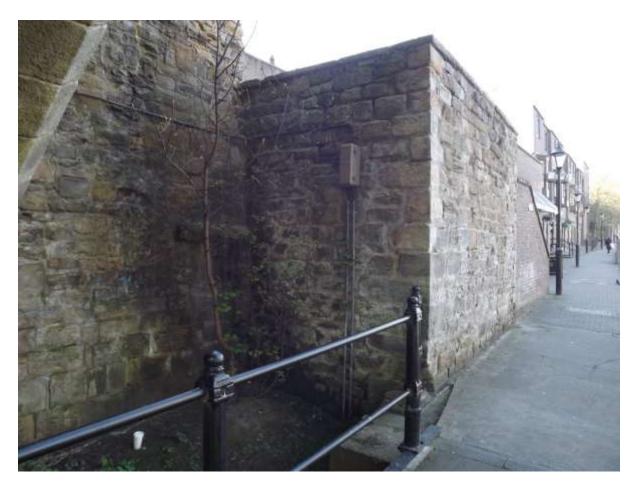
Secondary structure just beyond the bridge abutment, partly overlying it, looking NNW
